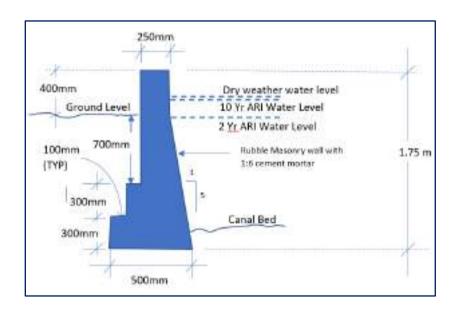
Proposed canal bank between Kochupally bridge & Valummel bridge
